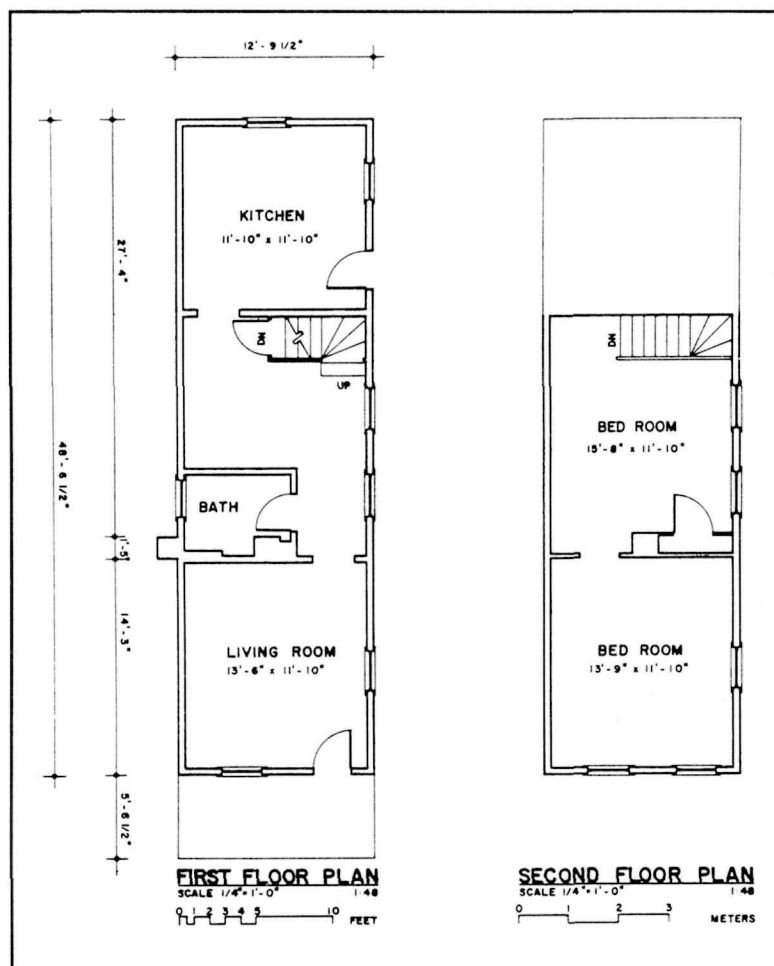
Alfred Bentley House, 1509 4th Ave., first- and second-floor plans. Drawn by Anette A. Jensen.
